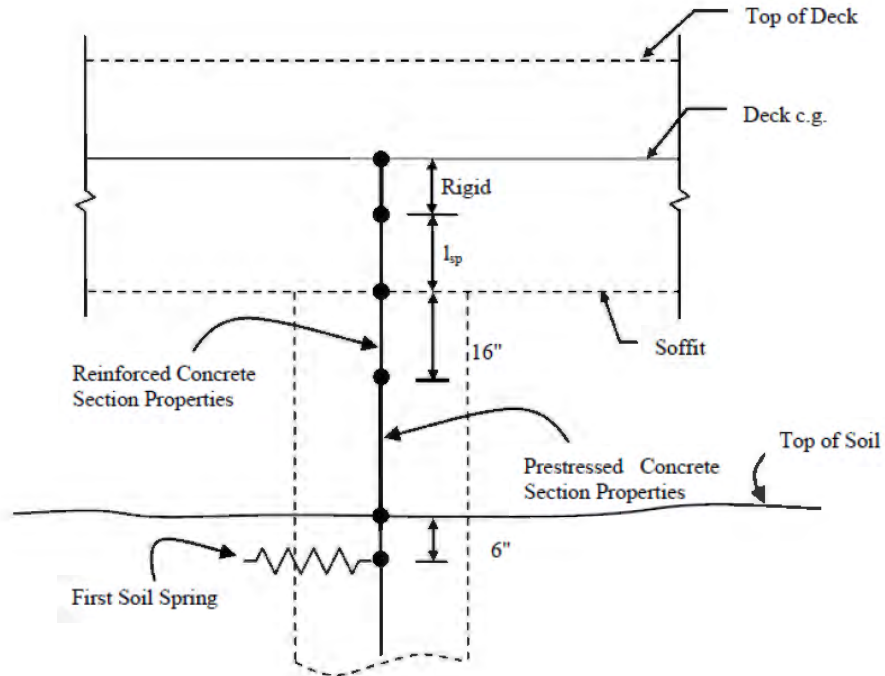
POLB Figure 4-3 Pile-Deck Structural Model schematic.
